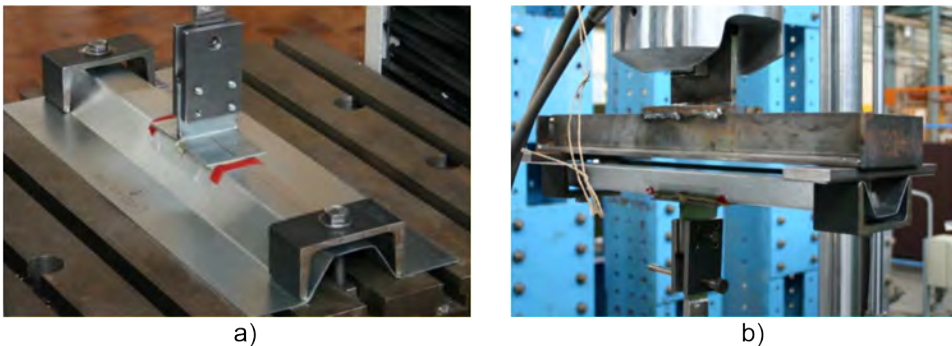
Test setup for specimen component tests: a) quasi-static test; b) cyclic test
